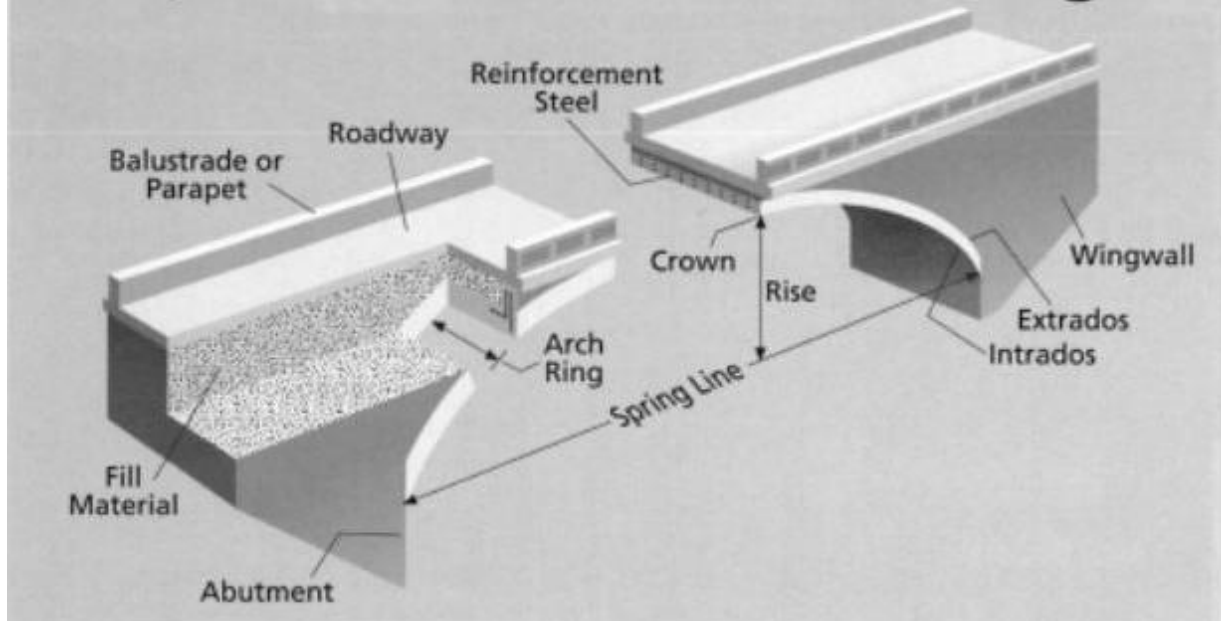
Anatomy of a Reinforced Concrete Deck Arch Bridge, Source: Delaware Department of Transportation: Archeology and Historic Preservation.
